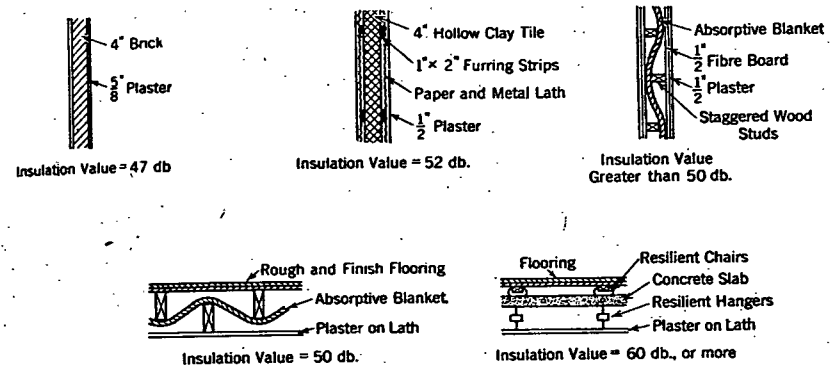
THREE WALL SECTIONS AND TWO FLOOR AND CEILING SECTIONS WHICH ARE SUITABLE FOR THE INSULATION OF EQUIPMENT ROOMS
